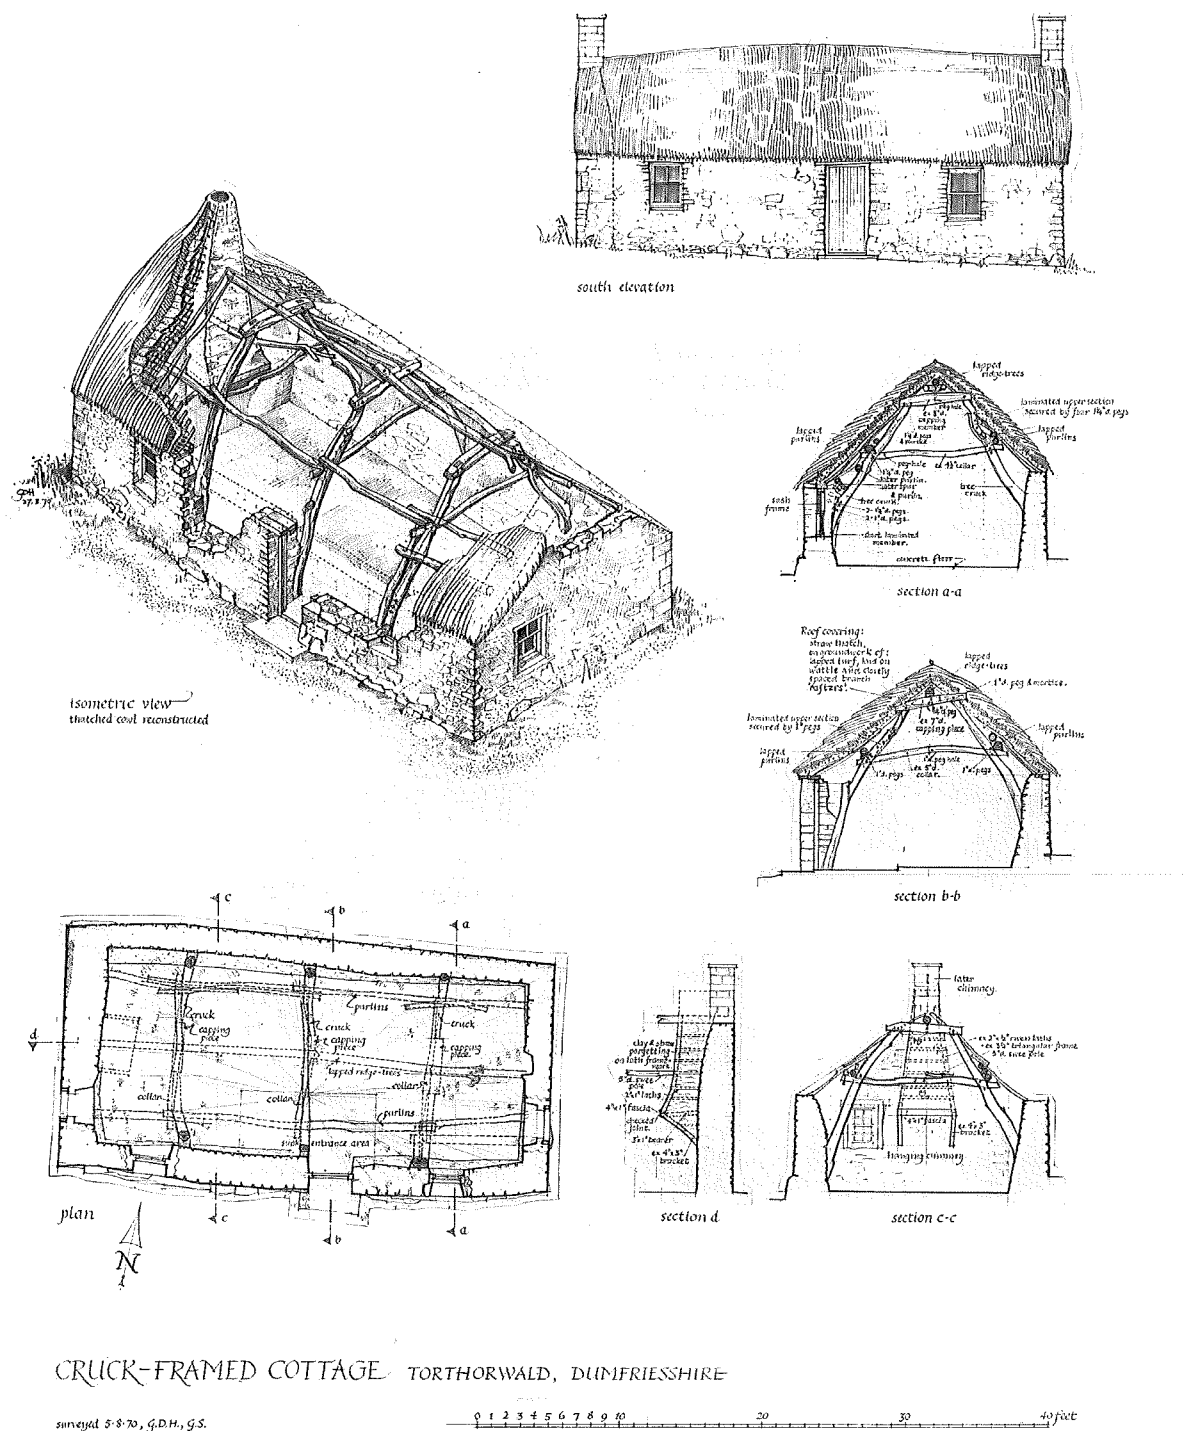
A drawing of the cruck-framed cottage at Torthorwald, Dumfries-shire, showing a typical cruck-frame construction with an isometric view. Crown Copyright RCAHMS.
